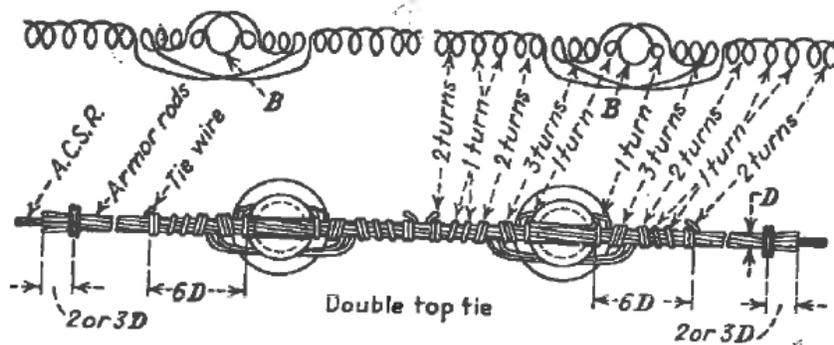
Double-pin-type insulator tie for ACSR aluminum cables equipped with armor rods. (Courtesy Aluminum Company of America.)
